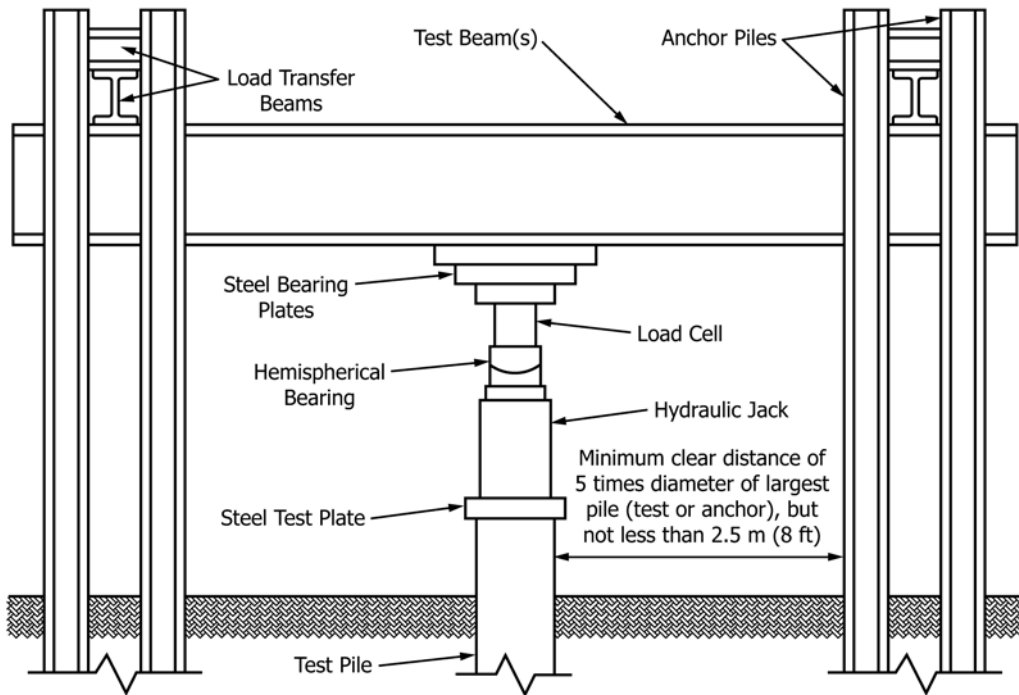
Schematic of Hydraulic Jack on an Element Acting against Anchored Reaction Frame
